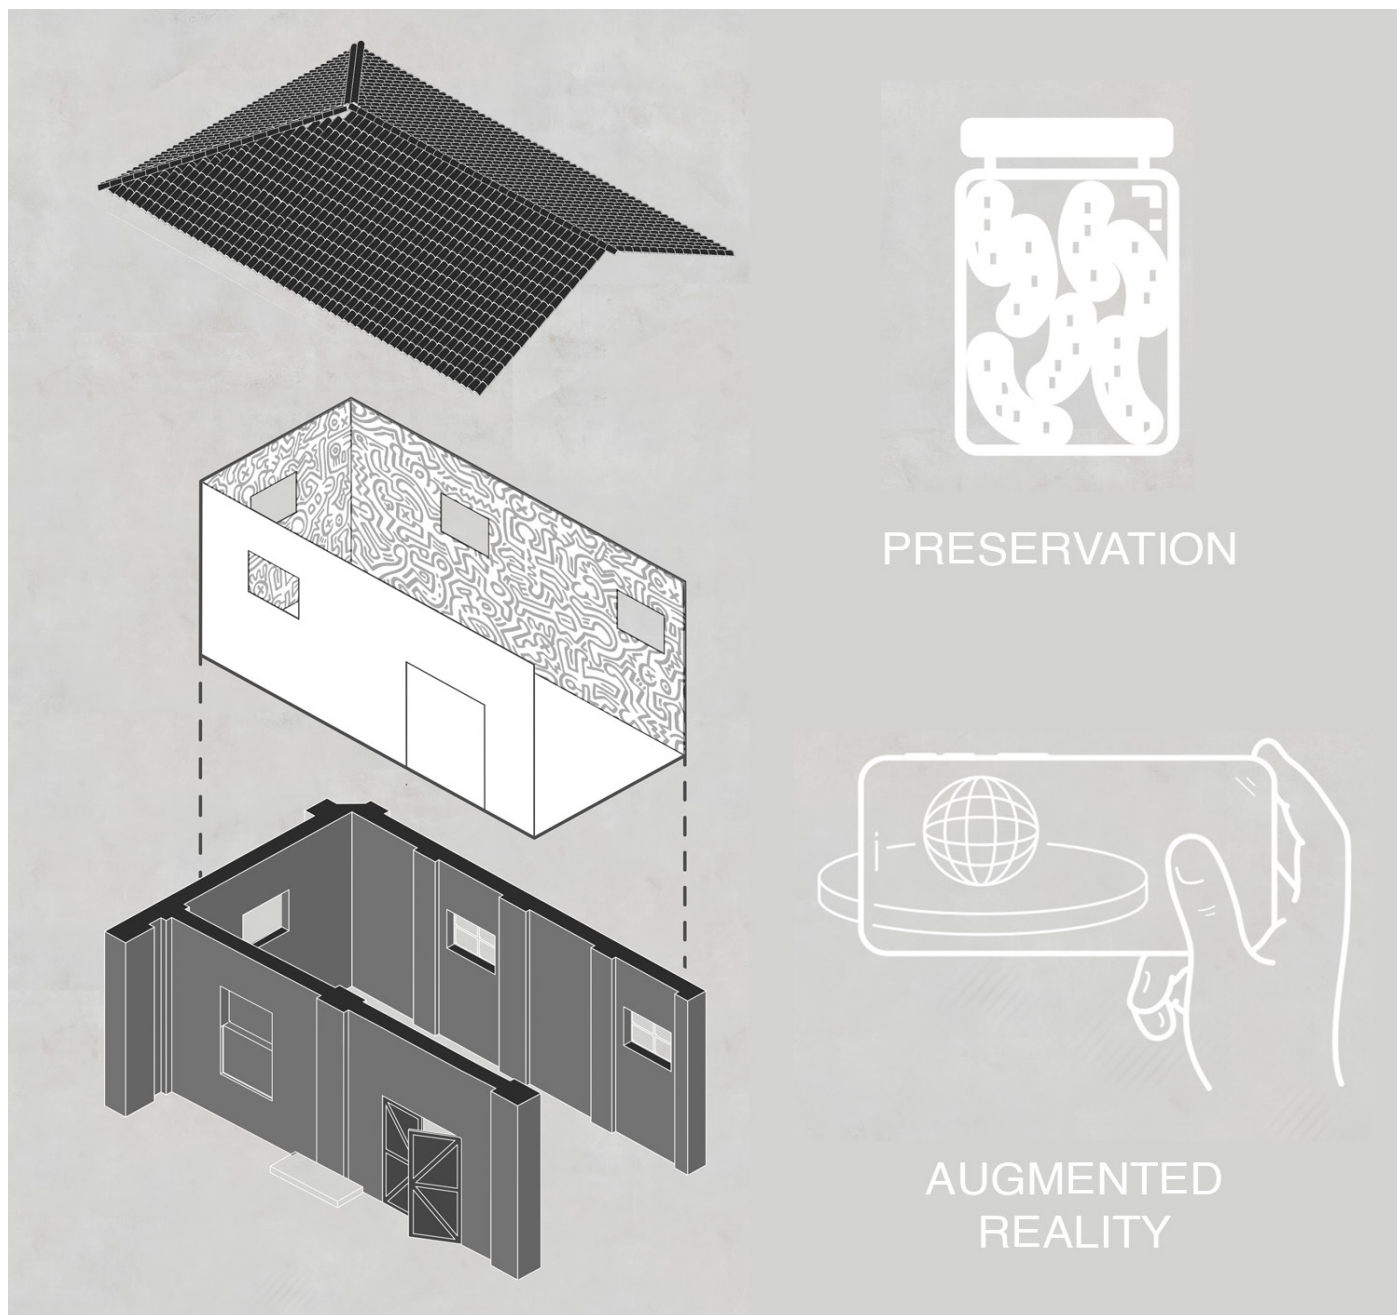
Concept diagram of the intervention, placing the box with markers inside the stables.
